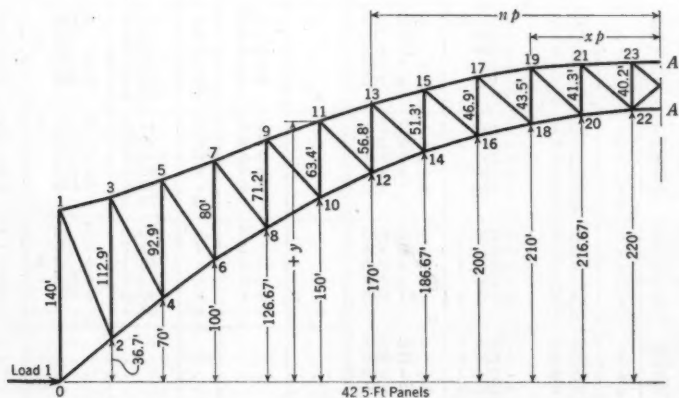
ELEVATION OF HALF ARCH, OVER HELL GATE, NEW YORK, N. Y.
